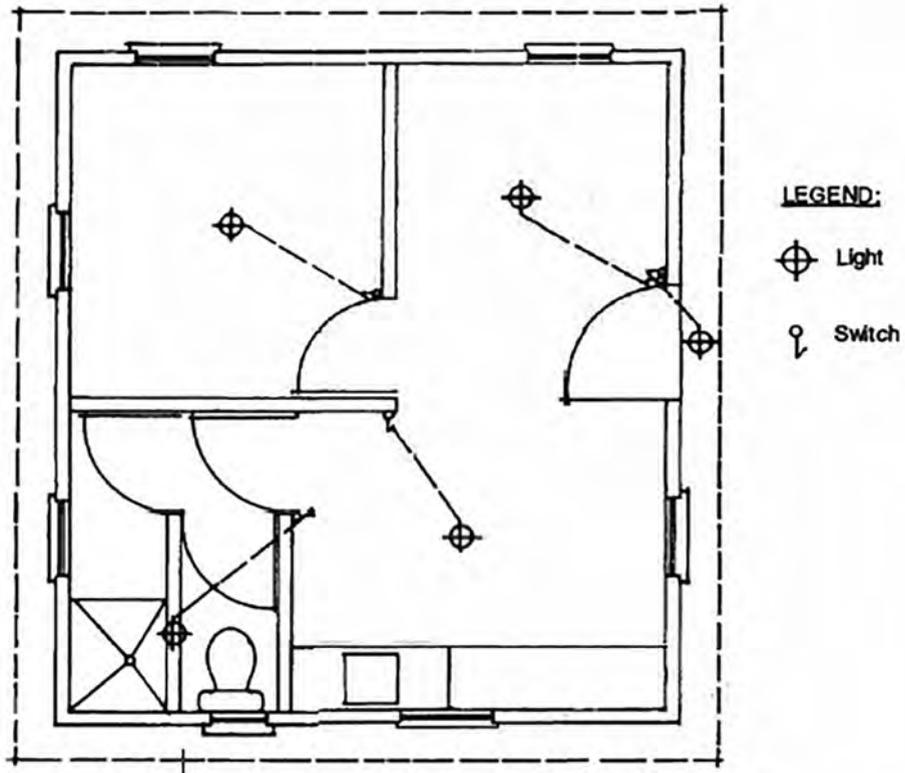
ELECTRICAL WIRING LAYOUT
